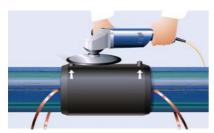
Removing the projecting wrap connectors with a suitable tool
